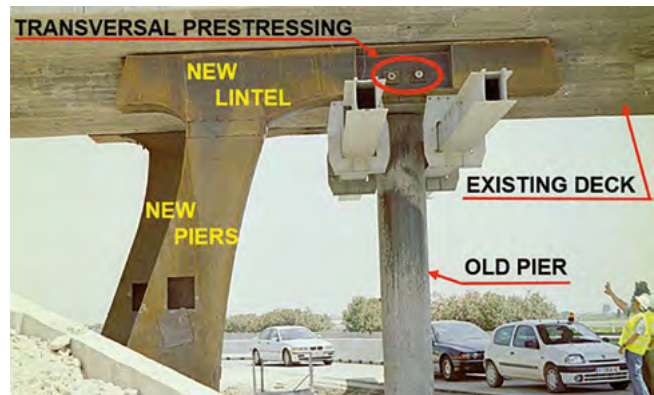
Construction stage prior to the removal of the old concrete pier and load transfer to the new steel lintel and pier.
